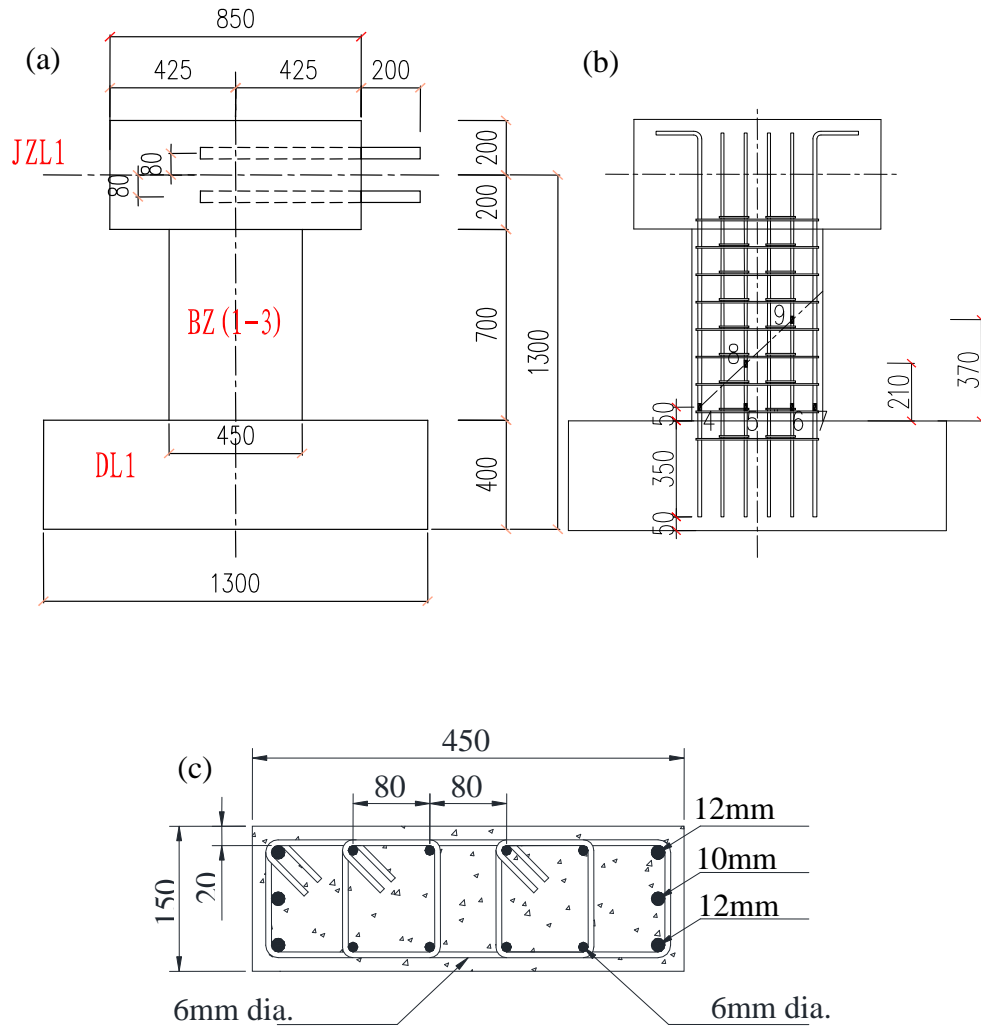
Dimension and reinforcements details for the RC shear wall specimen: (a) specimen dimensions (mm); (b) reinforcements details (elevation view, in mm); (c) cross section dimensions and reinforcements [144]¹⁹
